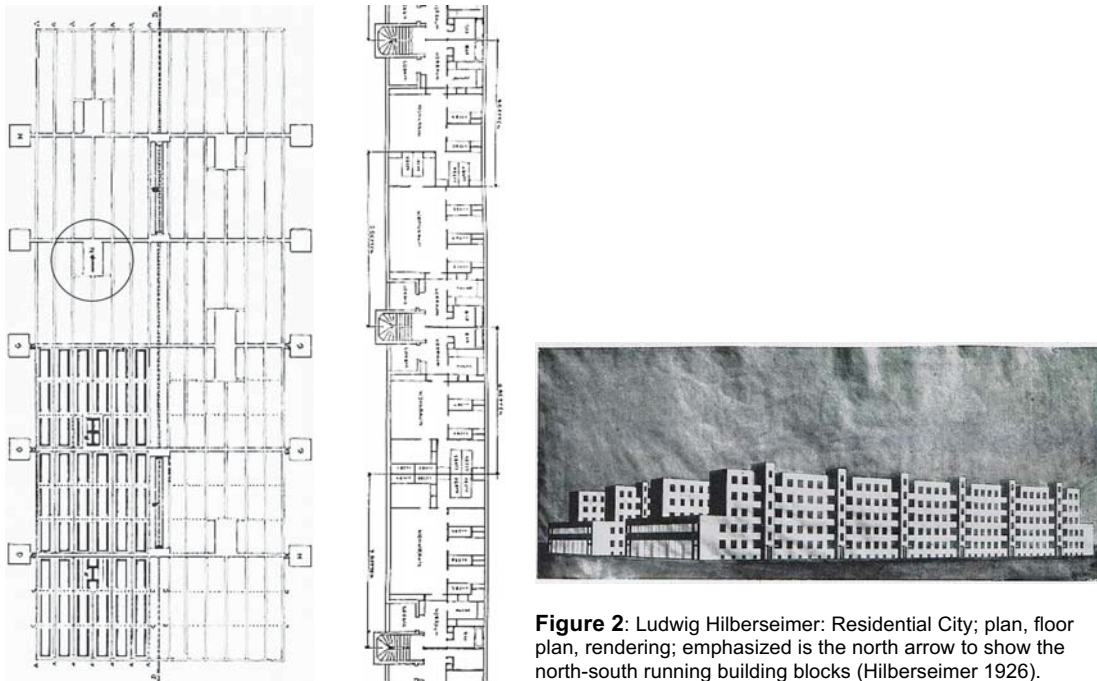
Ludwig Hilberseimer: Residential City; plan, floor plan, rendering; emphasized is the north arrow to show the north-south running building blocks (Hilberseimer 1926).
